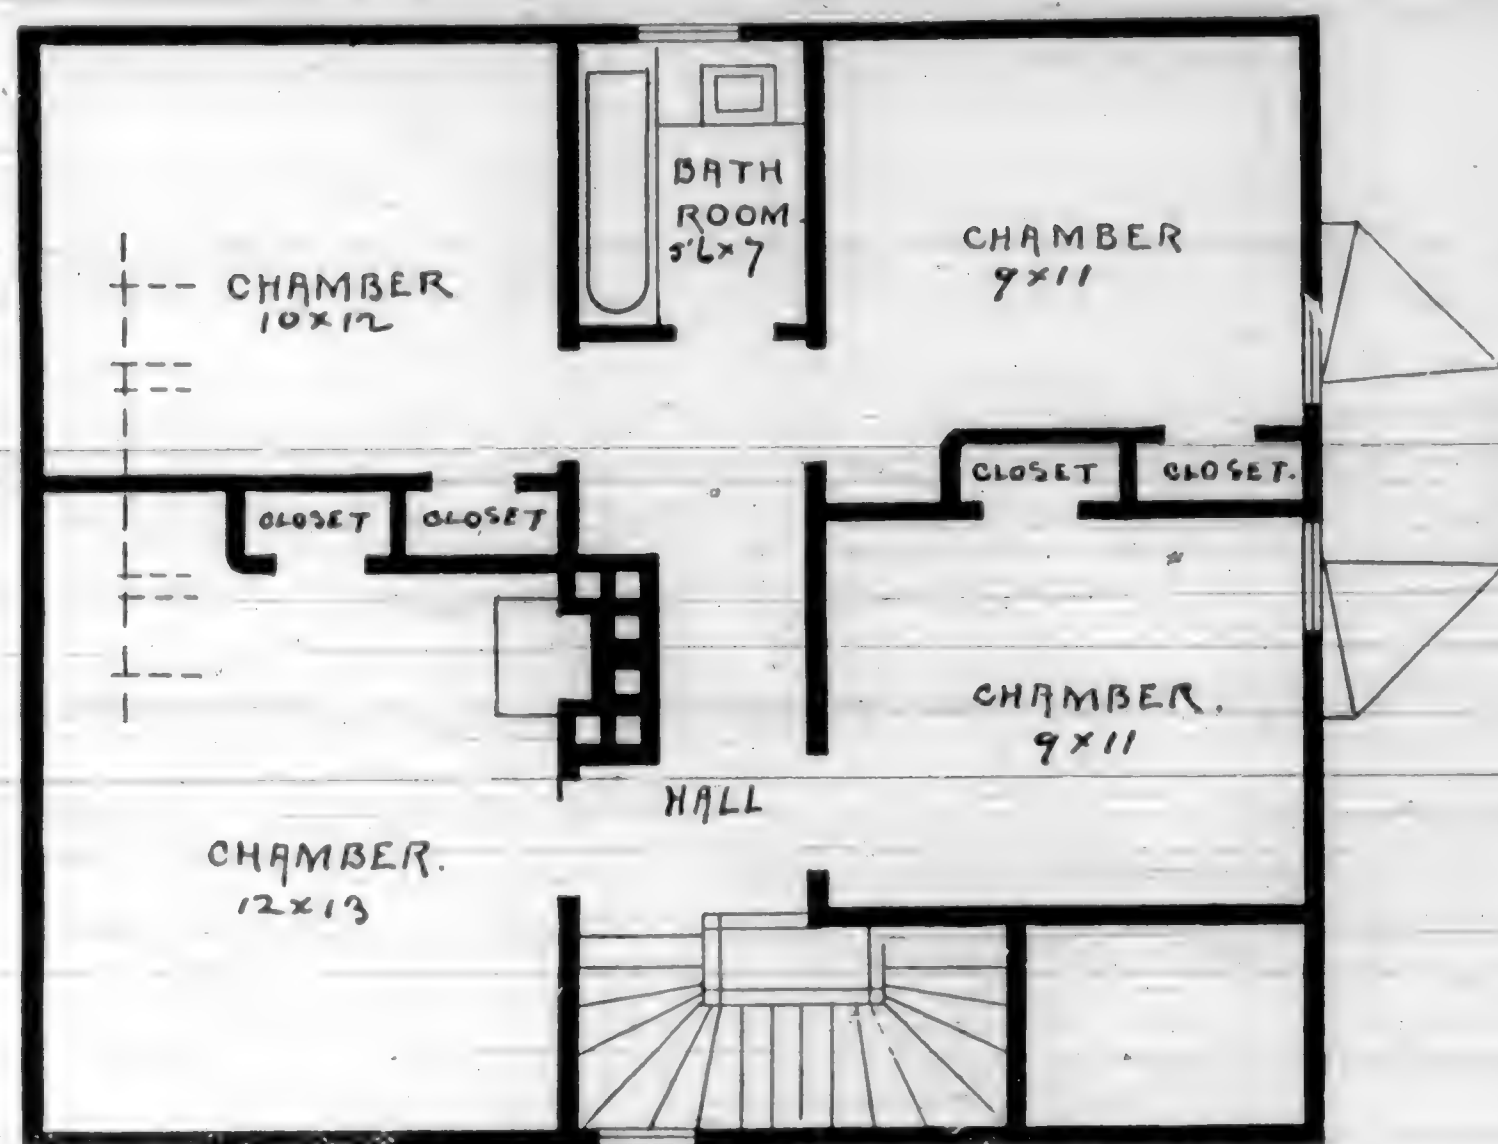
A COUNTRY COTTAGE. SECOND FLOOR PLAN.
